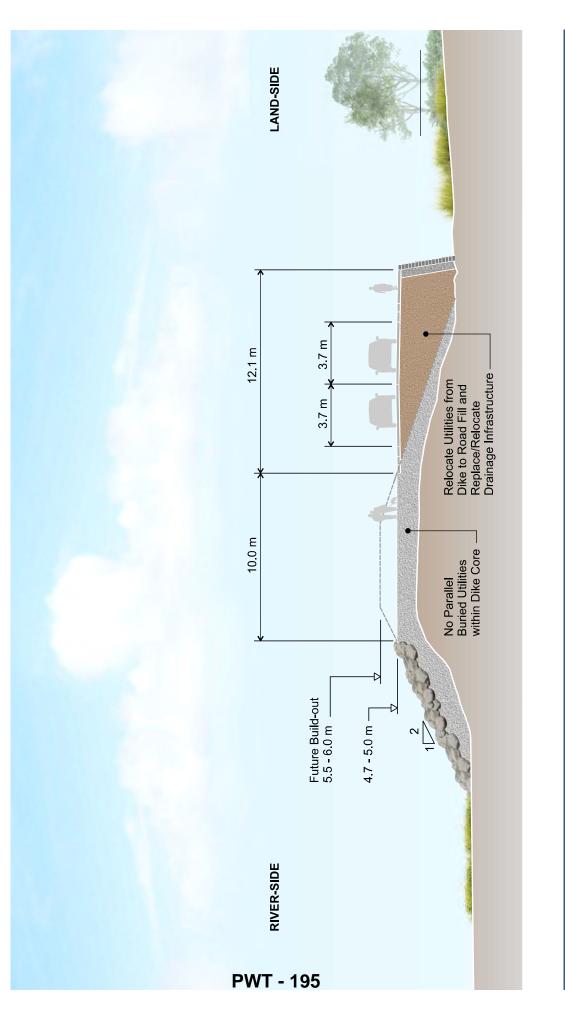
Option 2: Raise Dike and Road with Retaining Walls (Reach 4)
